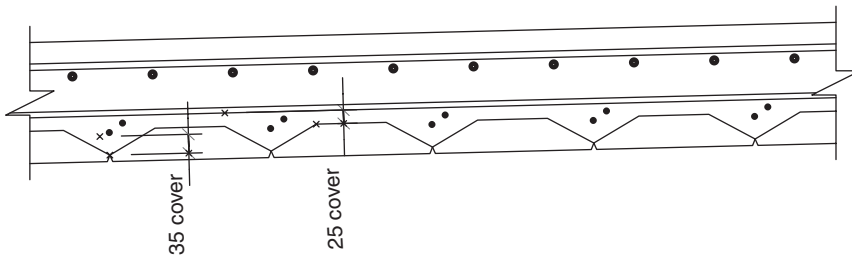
Detailing of reinforcement at precast permanent formwork
